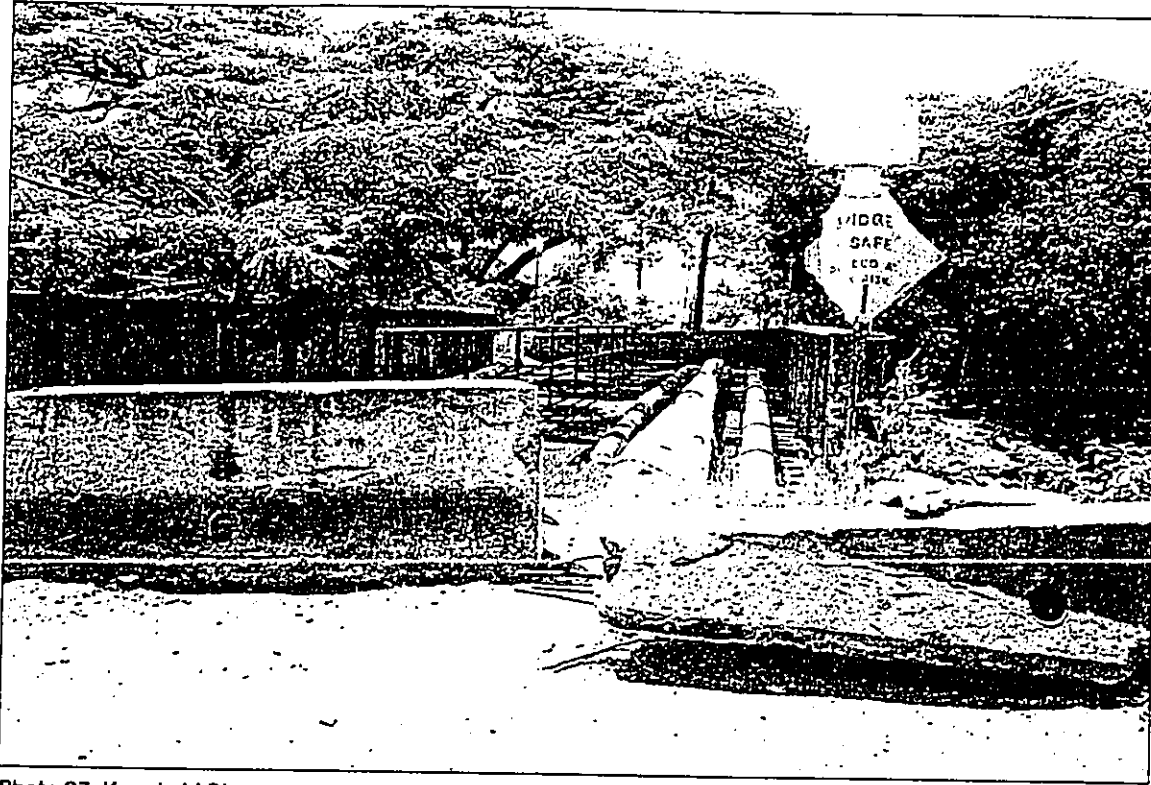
Kapakahi Stream crossing at Waipahu Depo Road. Note the pipelines also traversing the bridge.
